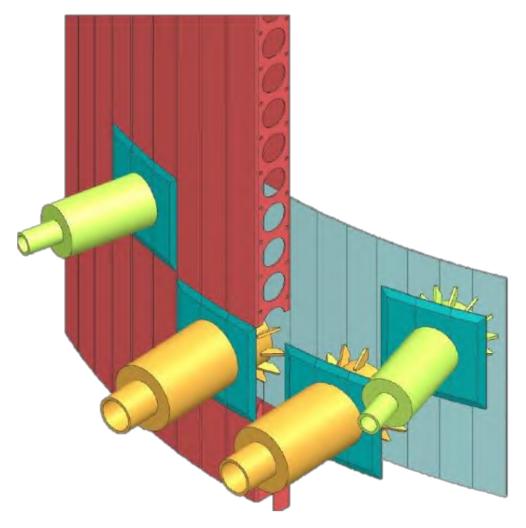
Containment Penetration Cross-Sectional View Without Containment Wall (Source: GE Hitachi)
